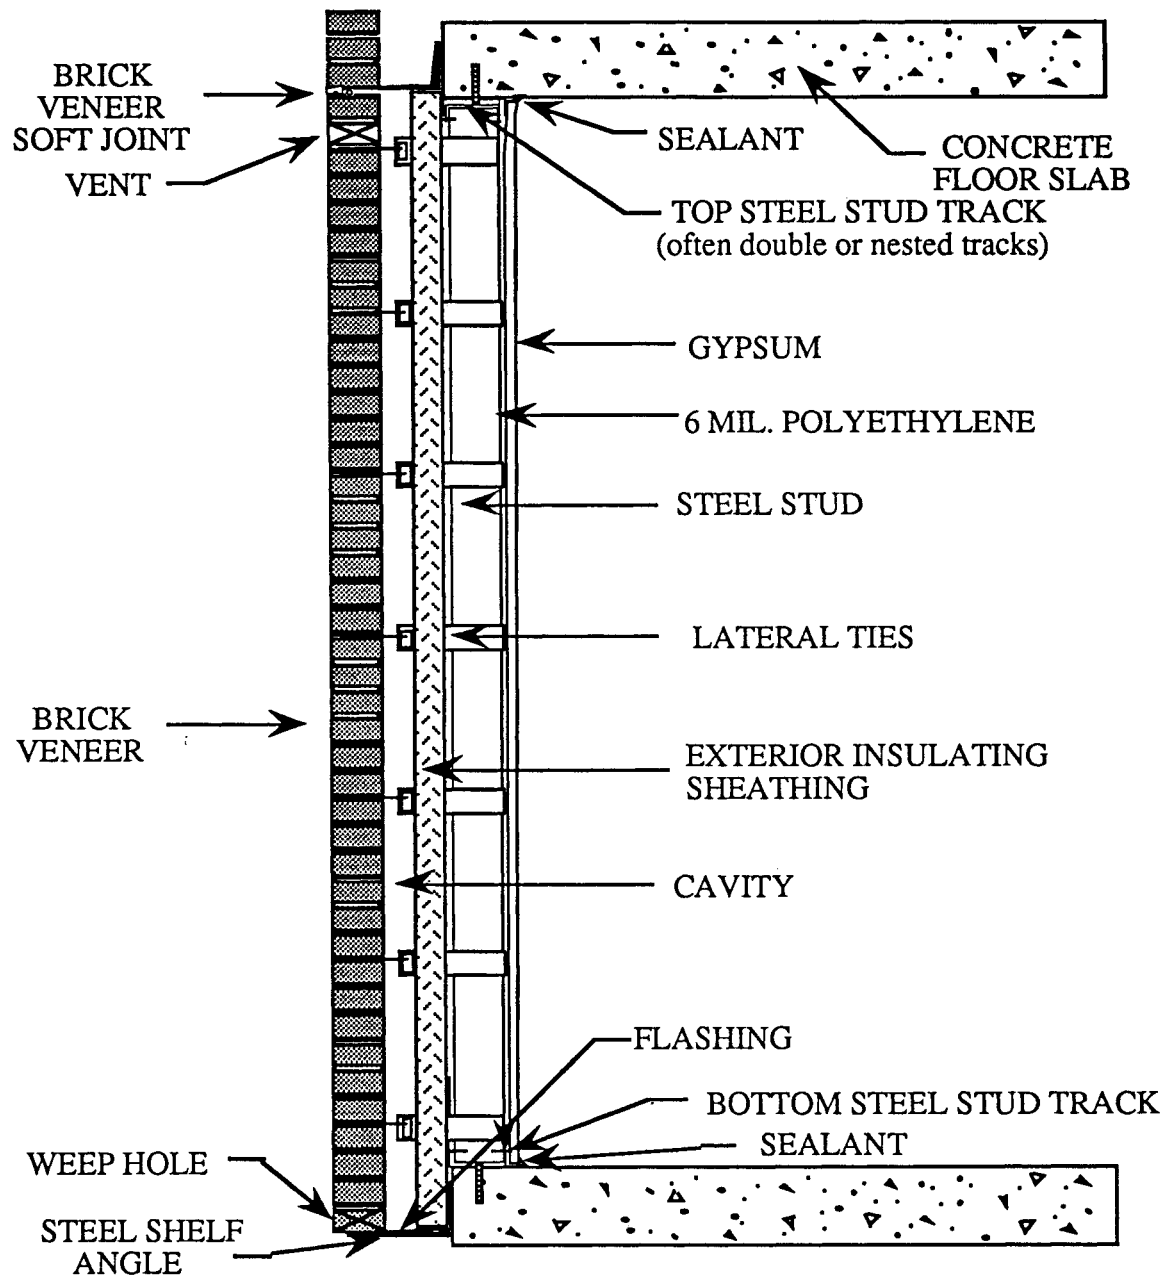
Cross-Section of a Typical BV/SS Wall
